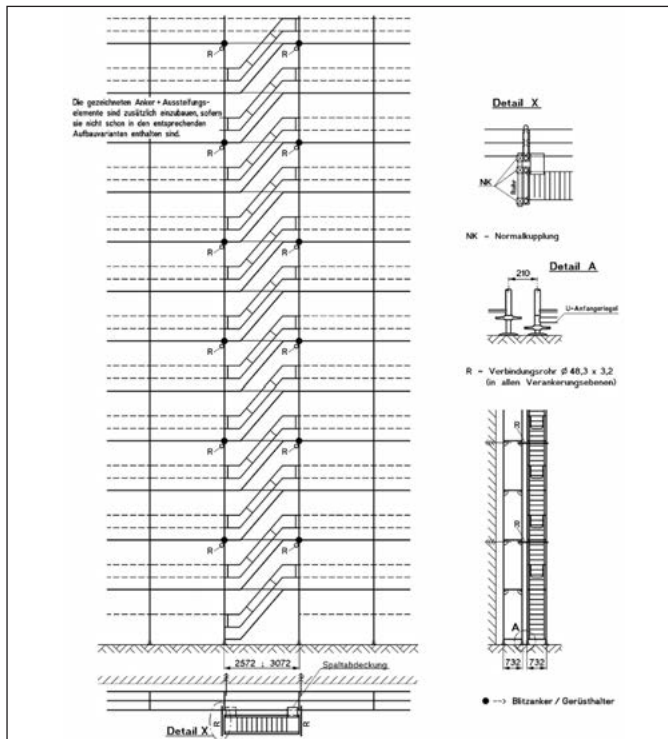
Anchoring of platform stairway access with scaffolding tubes
